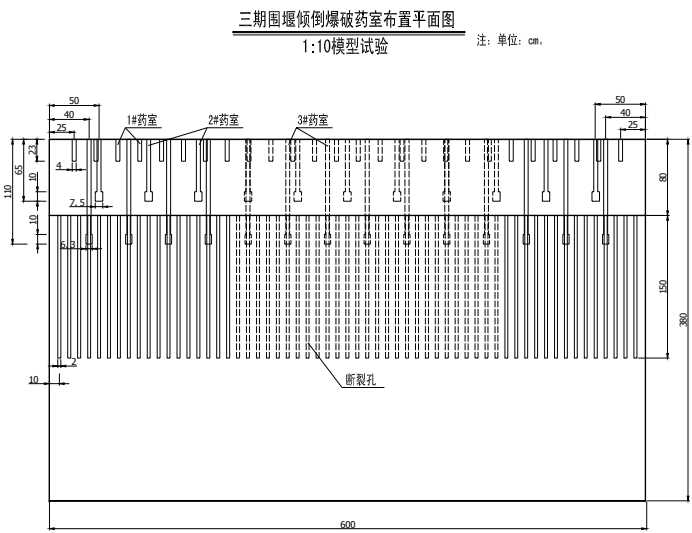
Plan View of the Arrangement of the Charge Chambers of the 1/10 Cofferdam Model
